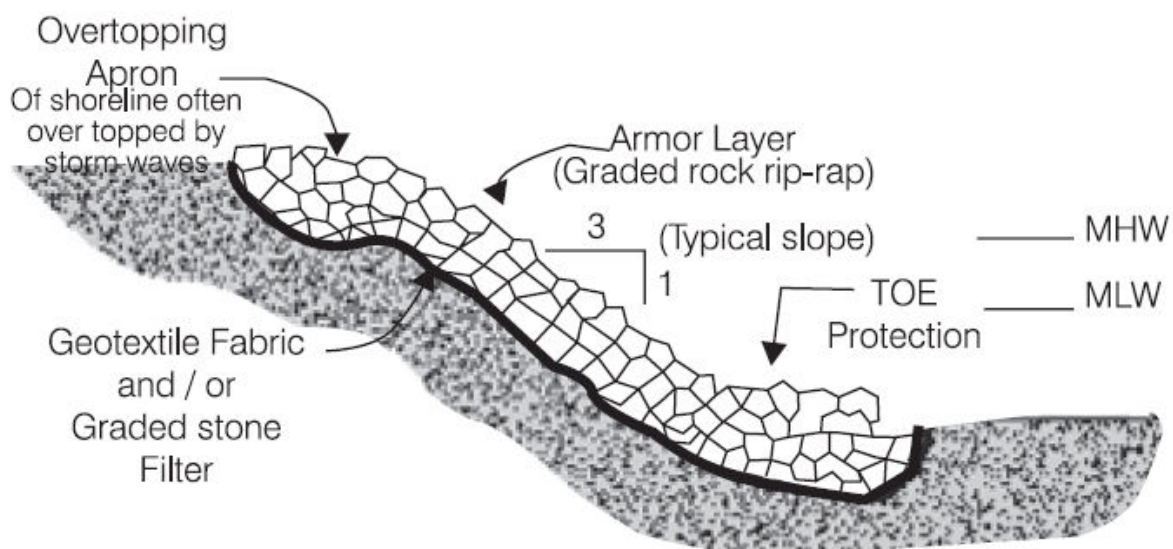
Typical erosion control system for lake shore, stream bank, culvert outfall or ditch protection
